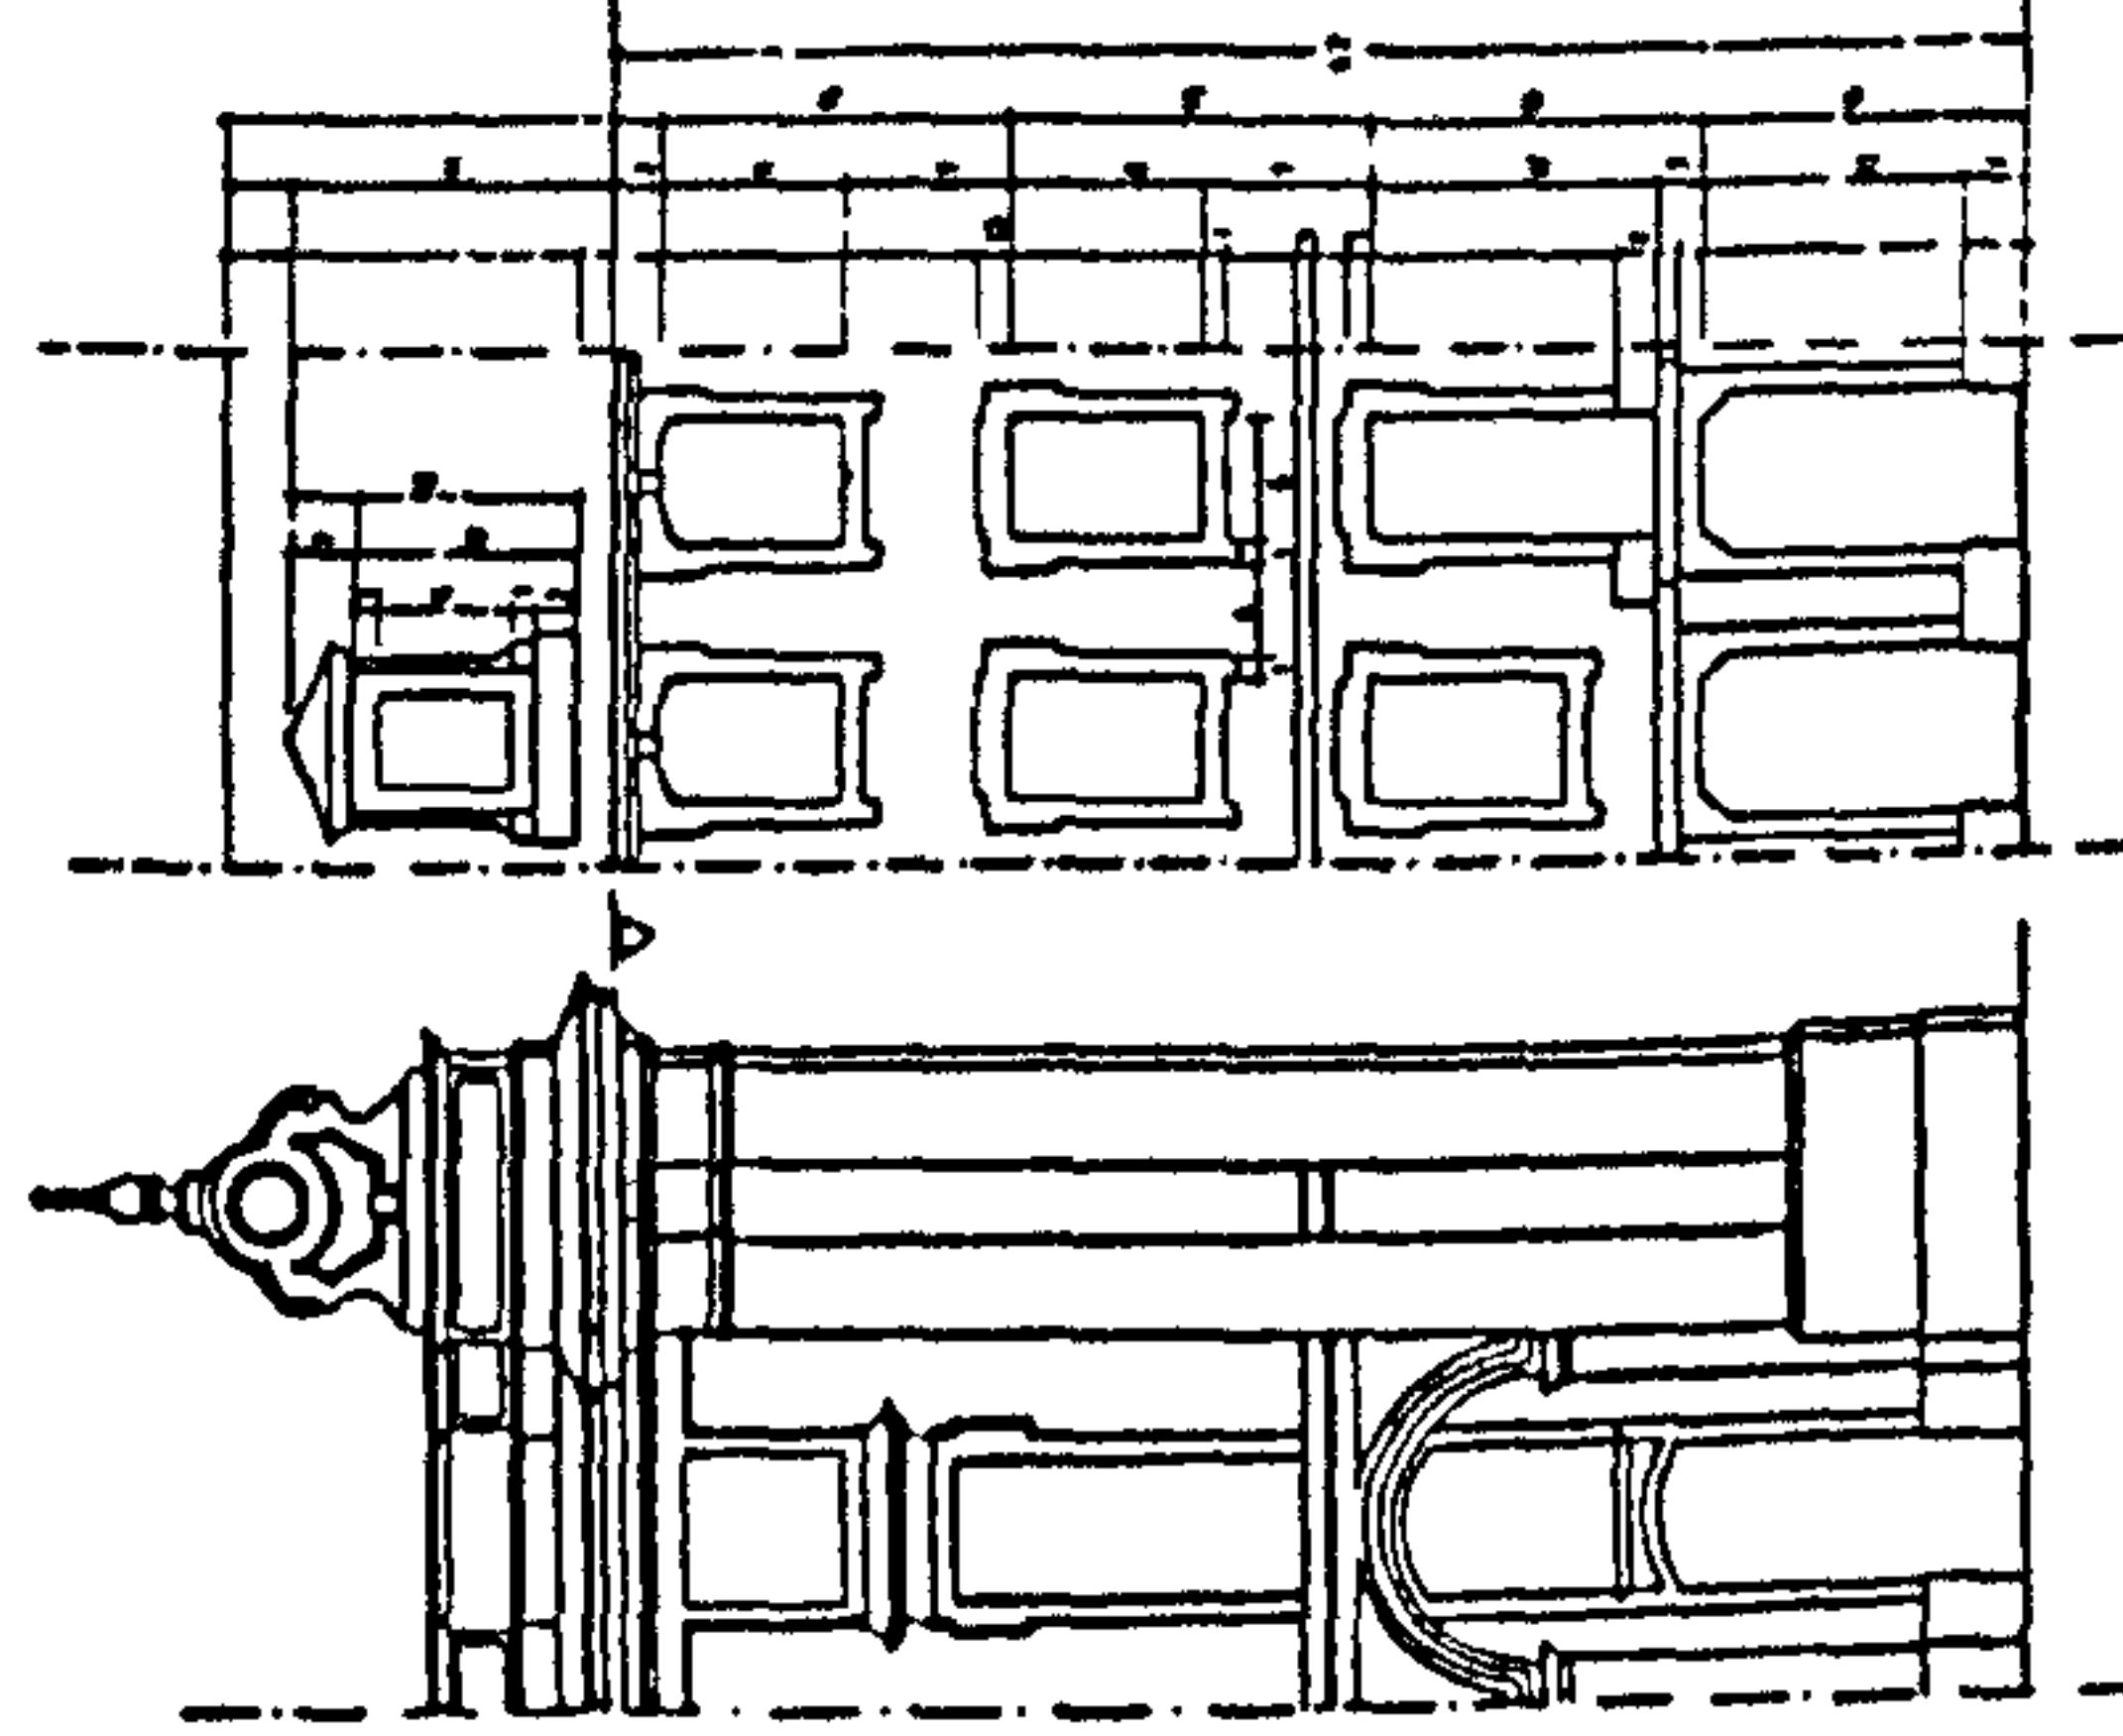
Typical construction of a Pombaline rentable building (6) Ouro Street. (Drawing by Jorge Mascarenhas)
